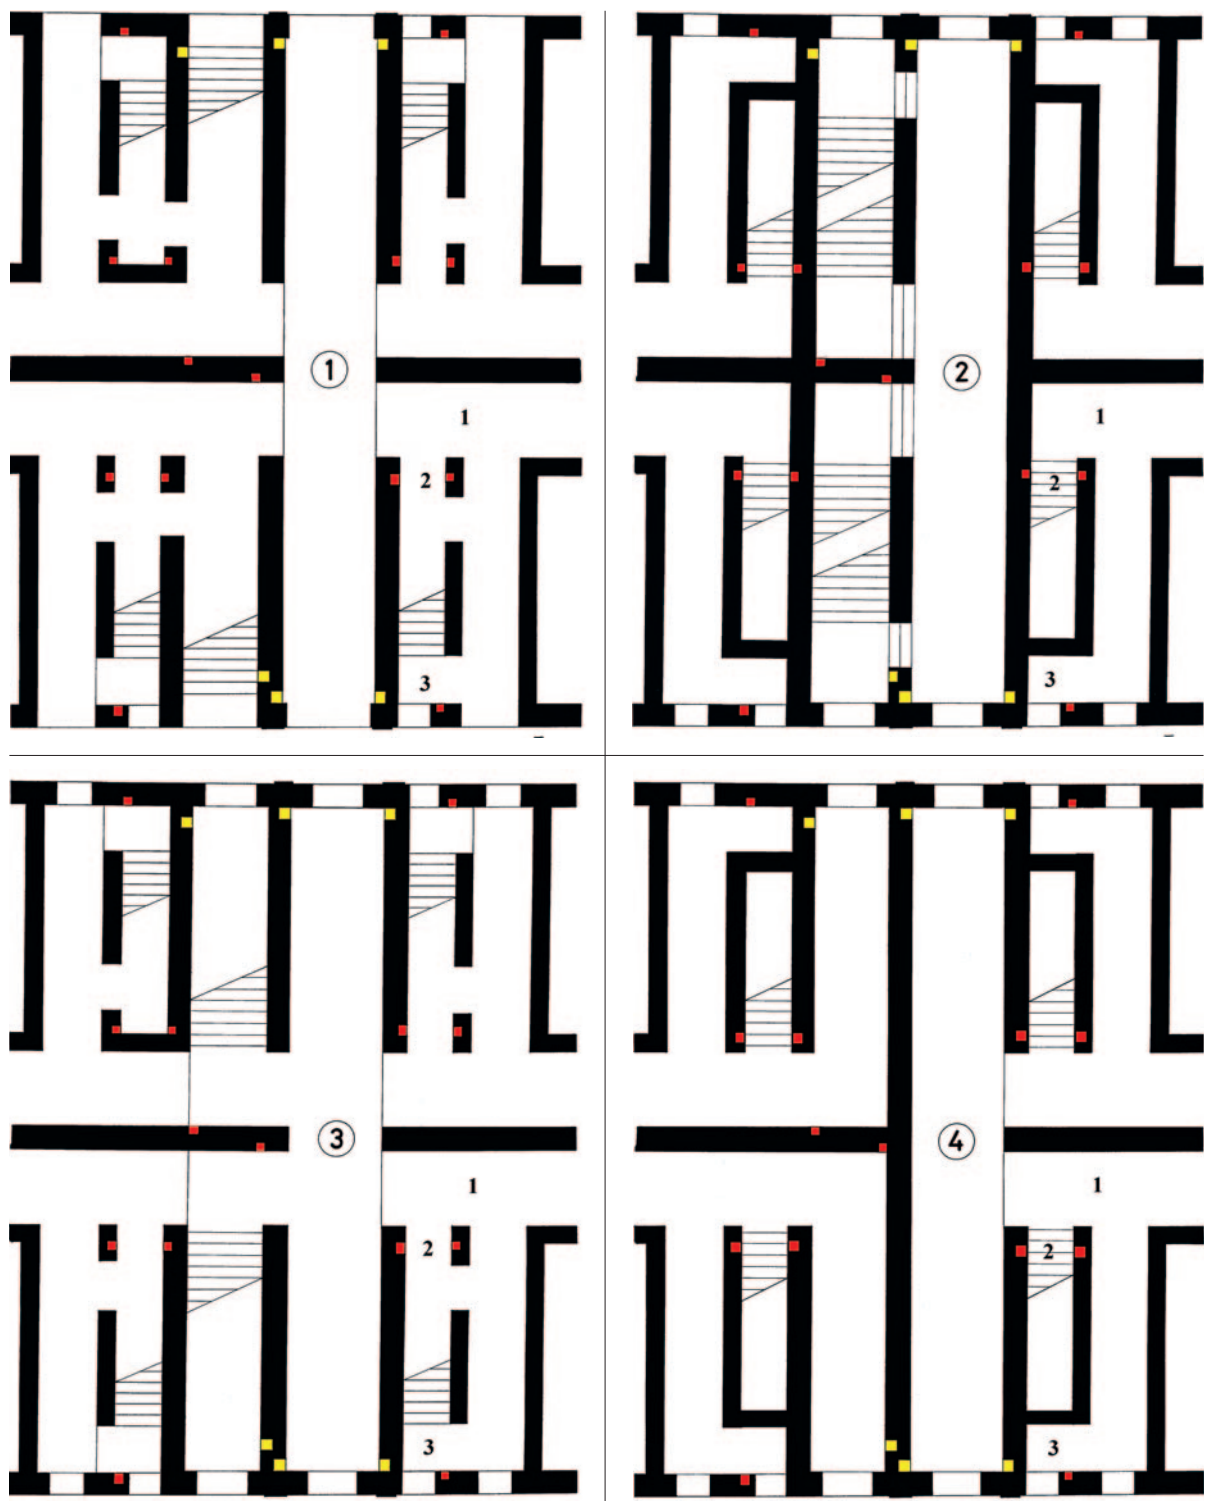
Plan of the recesses for water supply and drainage on the ground floor (1) of the northern apartment block of the Garden Houses and a reconstruction of the second, third and fourth floors (2, 3, 4). The recesses used for water supply are marked in yellow and the ones used for drainage are coloured red (plans Saskia Stevens).
